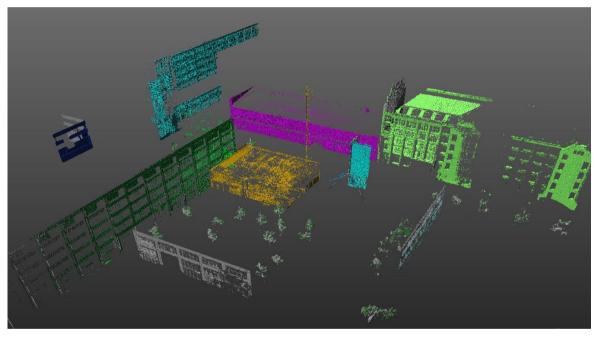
Point Cloud Model of Test Building (Source - HTW Berlin)
